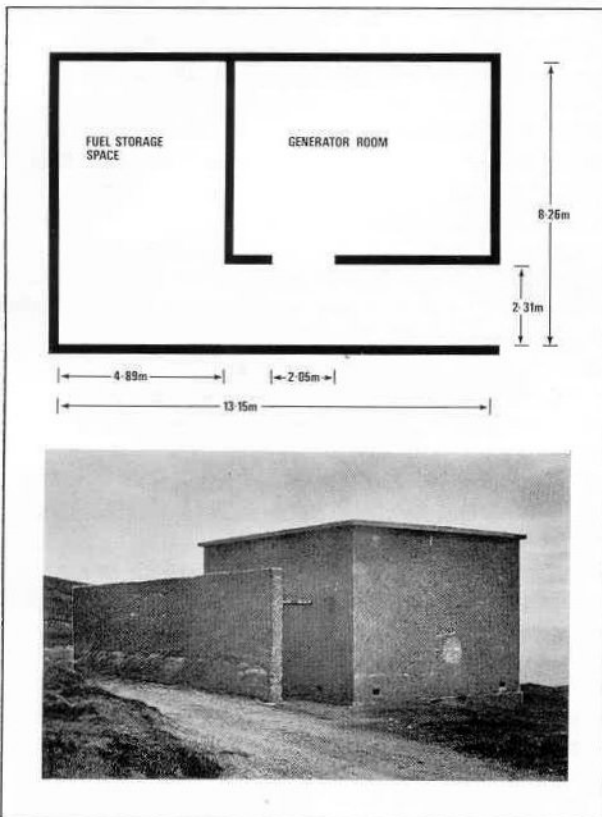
The link equipment on Fair Isle is housed in a converted ex-wartime radar building. The illustration shows an outline plan and a photograph of the building as it was prior to reconstruction.
